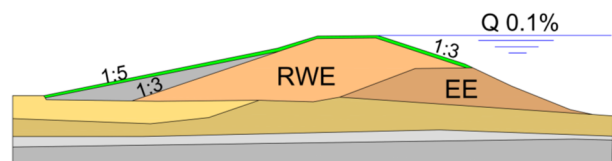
Type 1 embankment (EE – existing embankment, RWE – raised and widened part).
